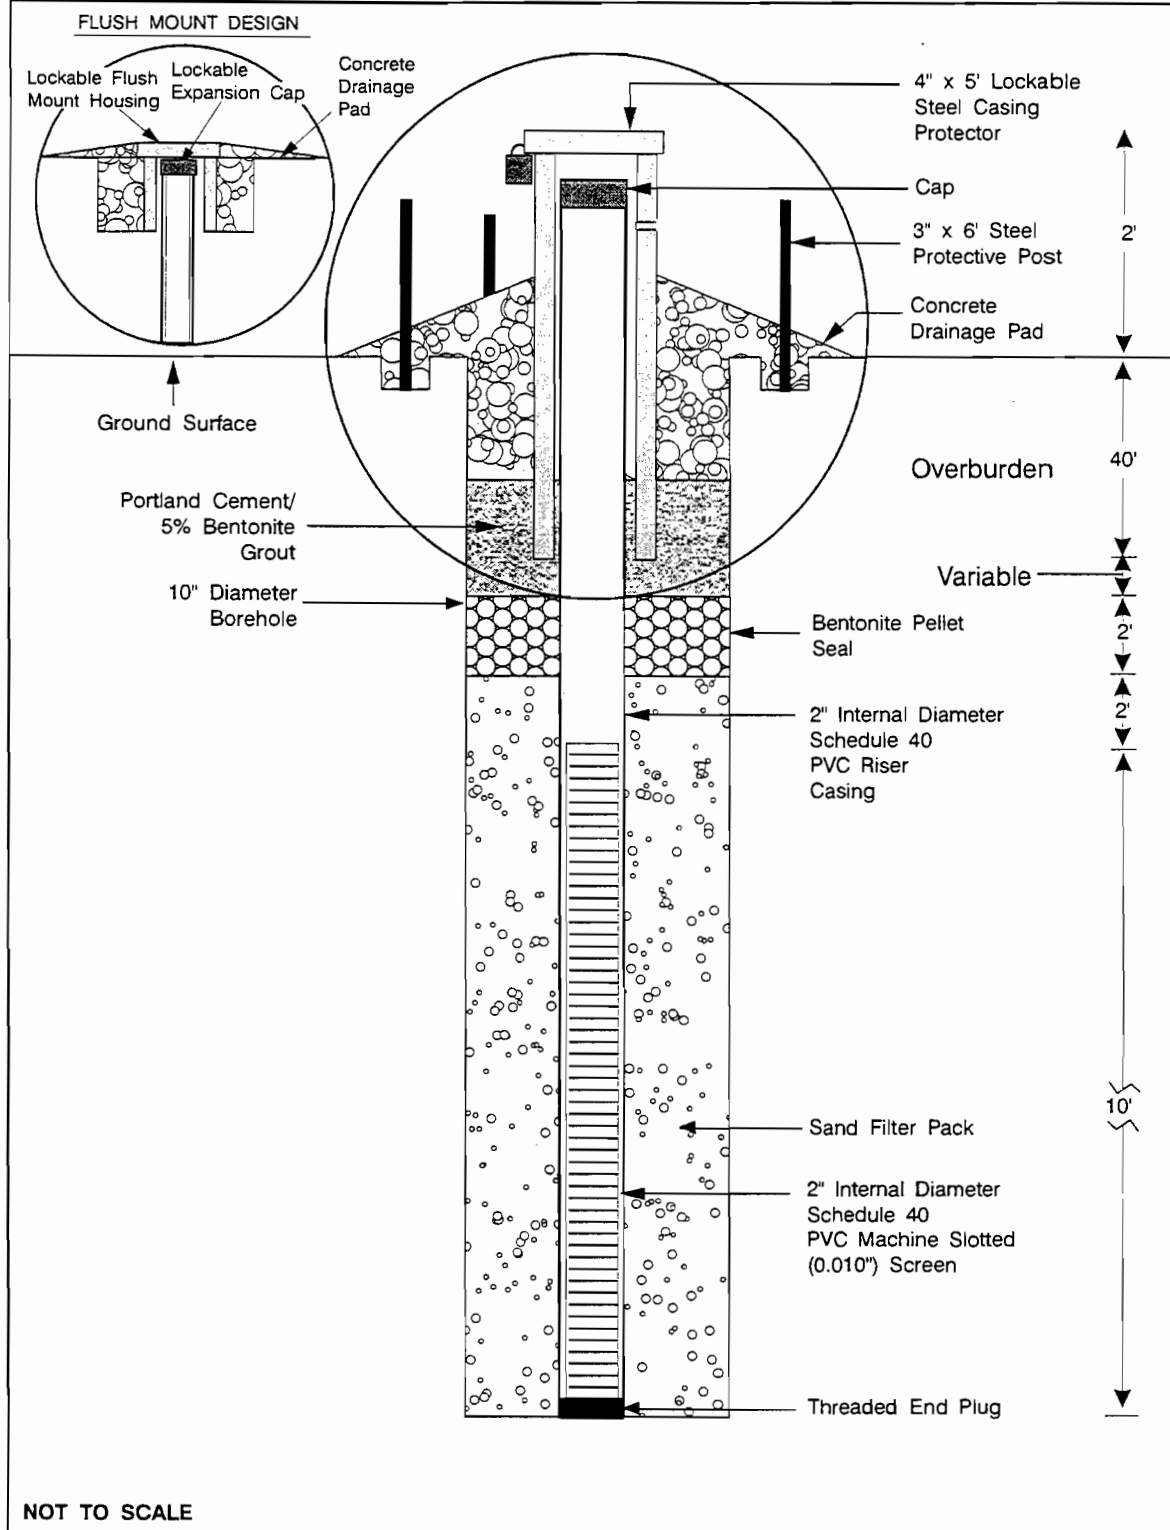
PROPOSED CONSTRUCTION FOR TELESCOPING OVERBURDEN GROUNDWATER MONITORING WELL
